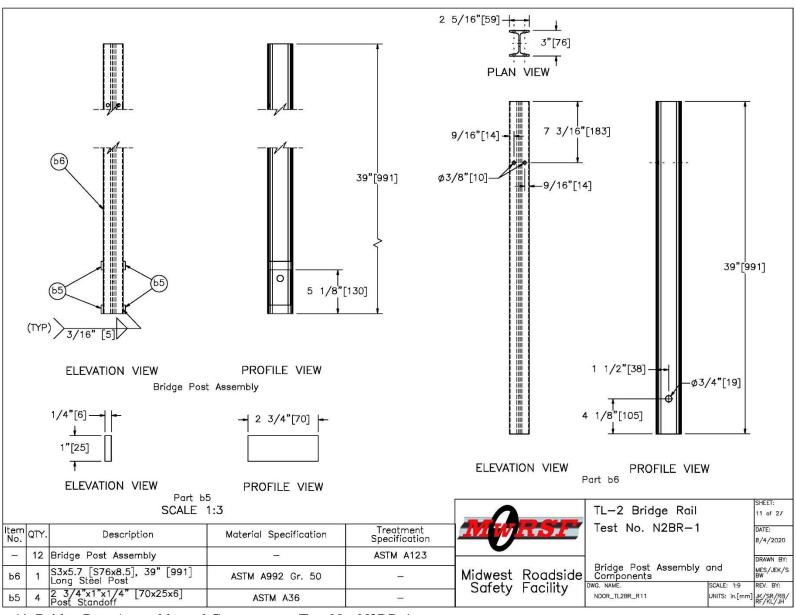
Bridge Post Assembly and Components, Test No. N2BR-1
